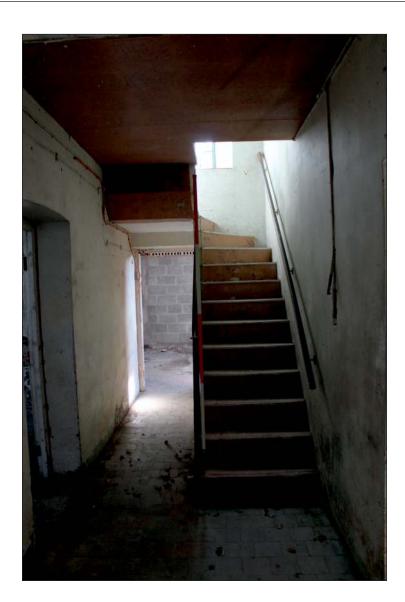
The passage and staircase in the west side of the central range, looking south (2m scale)
